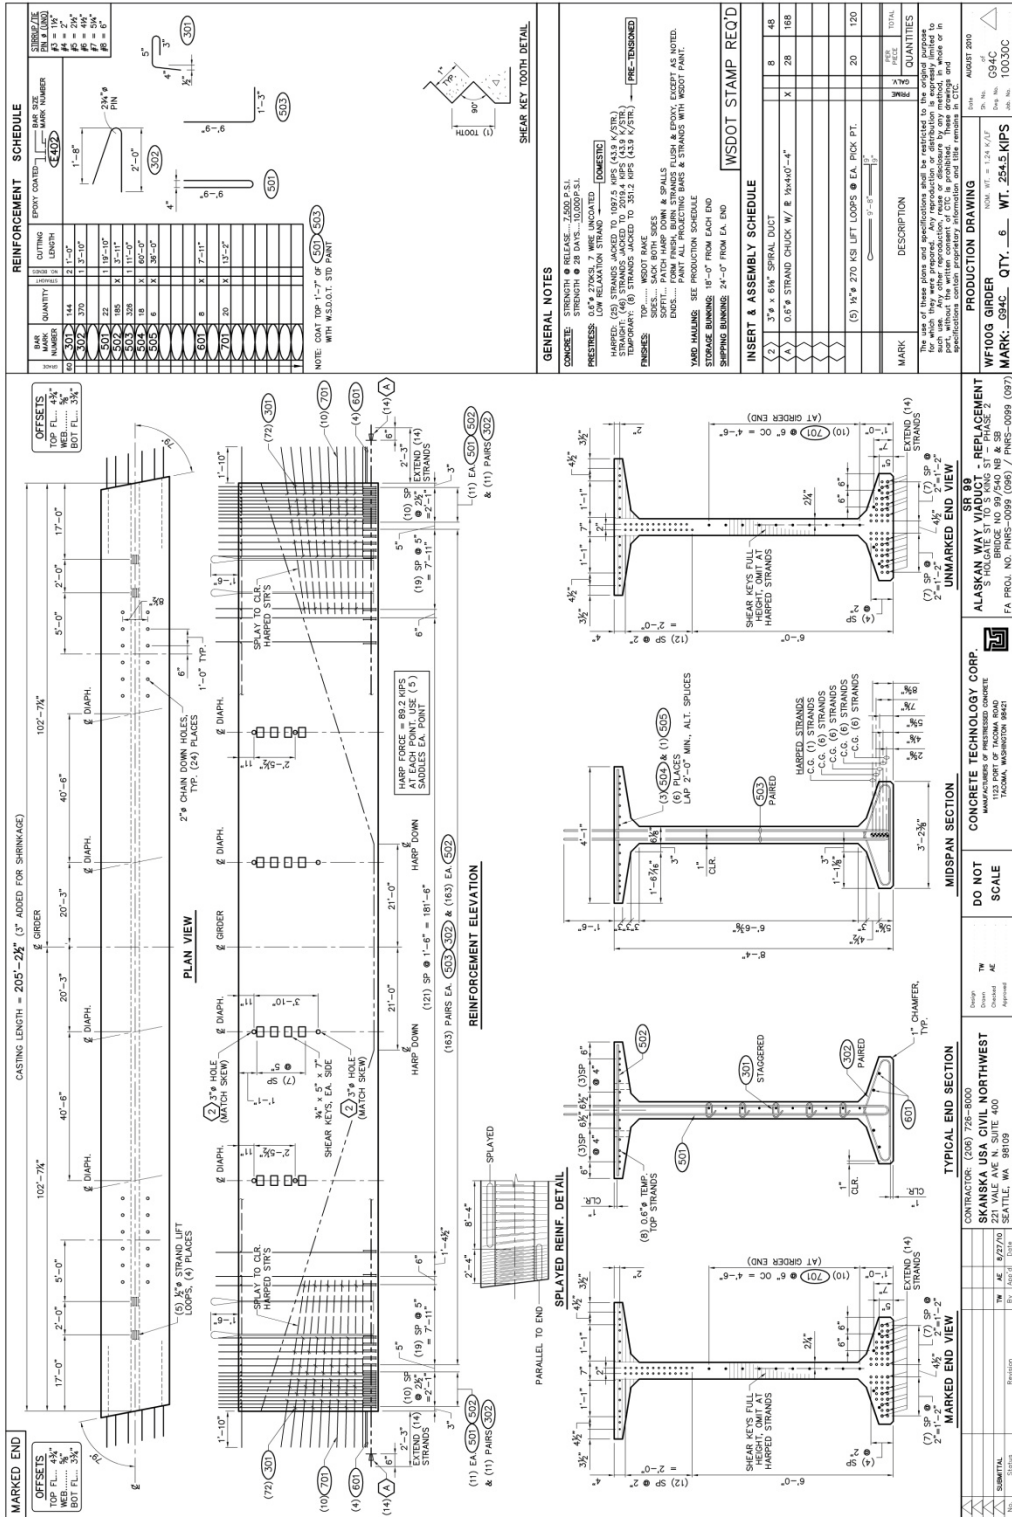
Fabrication shop drawings for BWF100 G94C girders (CTC, 2010).
